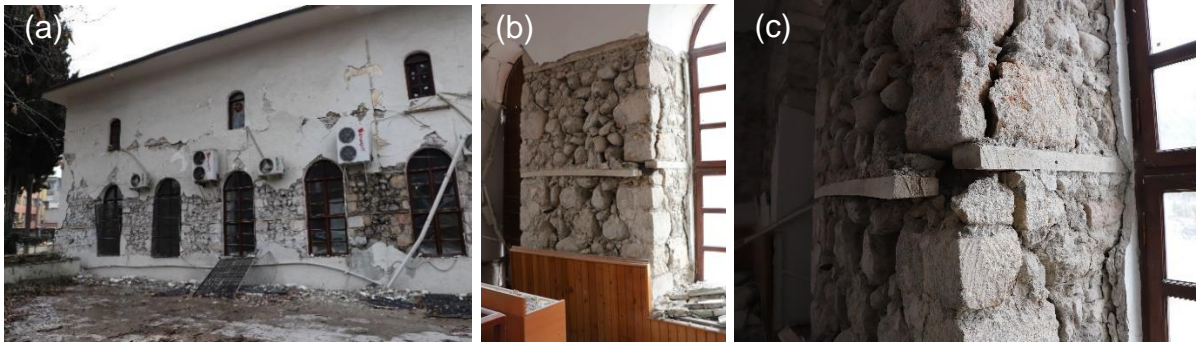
Enverul Hamit Mosque, photographs of (a) the east façade, (b) a rubble pier in the east façade, (c) a large crack around the poorly connected tie-beams in the east façade.
